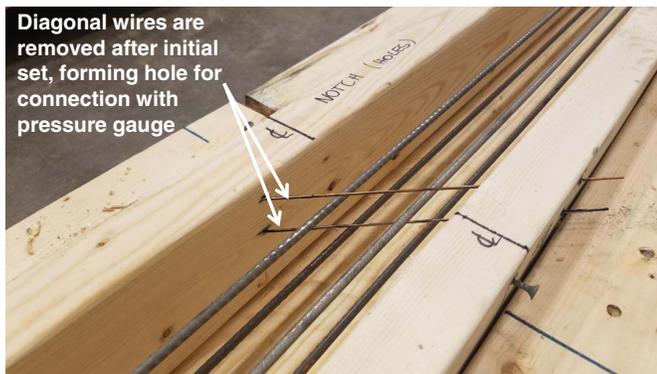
Form detail showing method for precasting 1.59 mm (1/16 in.) holes (diagonal wires removed after initial set of concrete).
